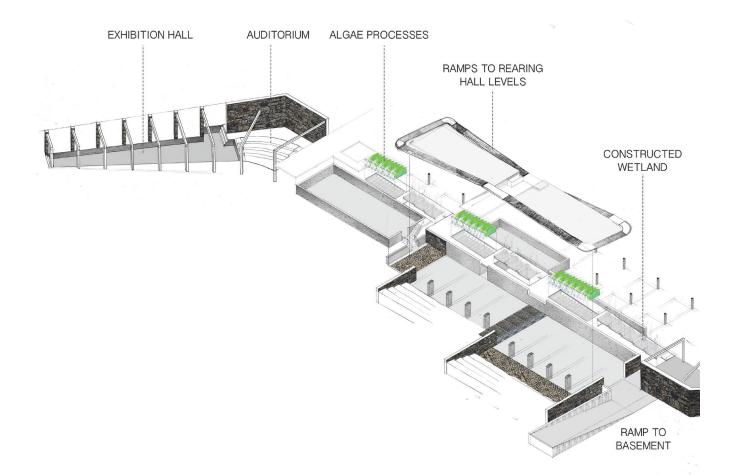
Planted roof and tapered gabion walls. (Author,2016)
